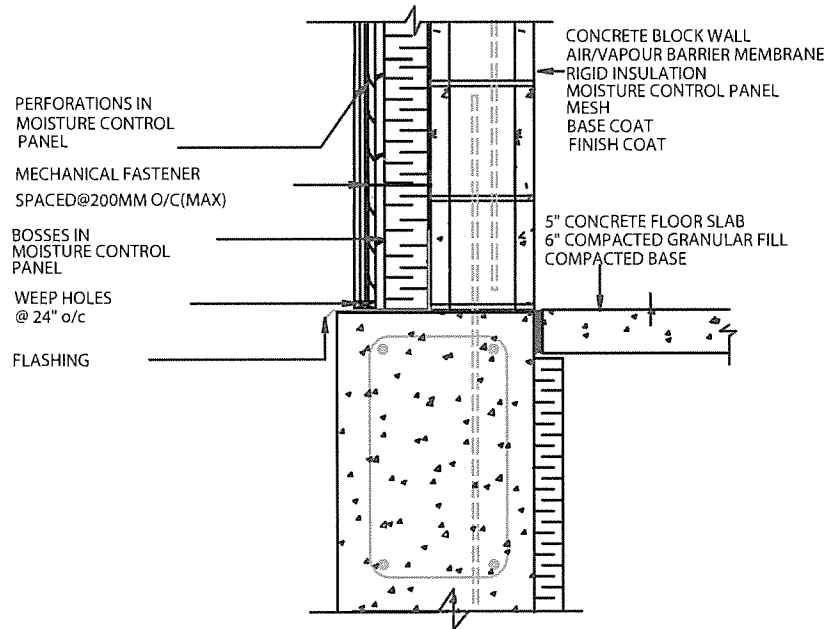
STUCCO / CONCRETE BLOCK
